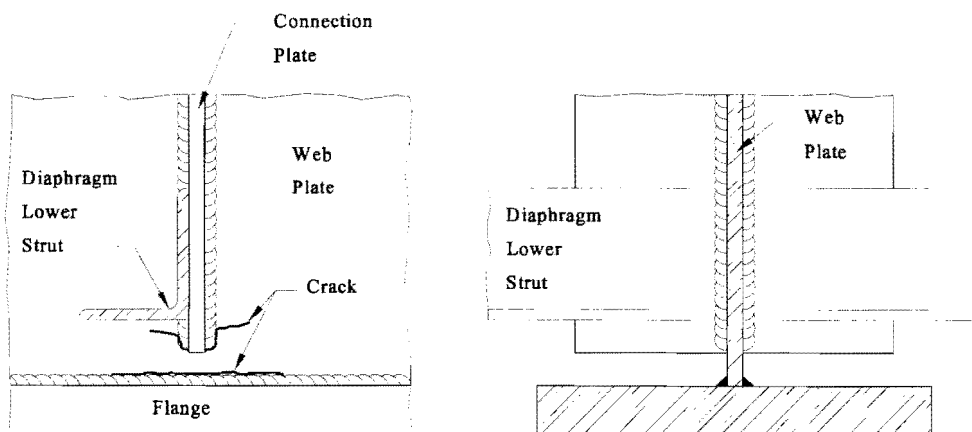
Fatigue cracking in web-gap detail.
